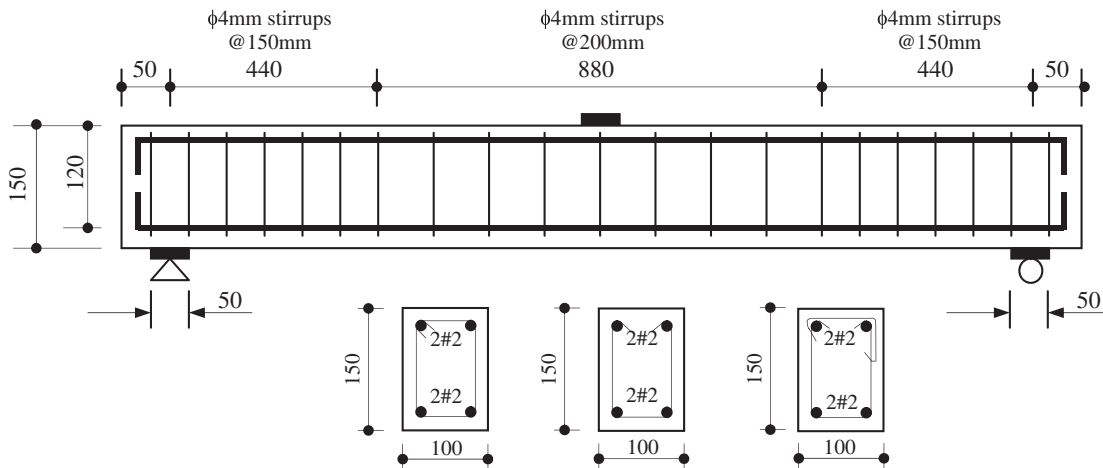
Beams dimension and cross section (a) closed stirrups; (b) open stirrups; (c) open stirrups with additional hook
